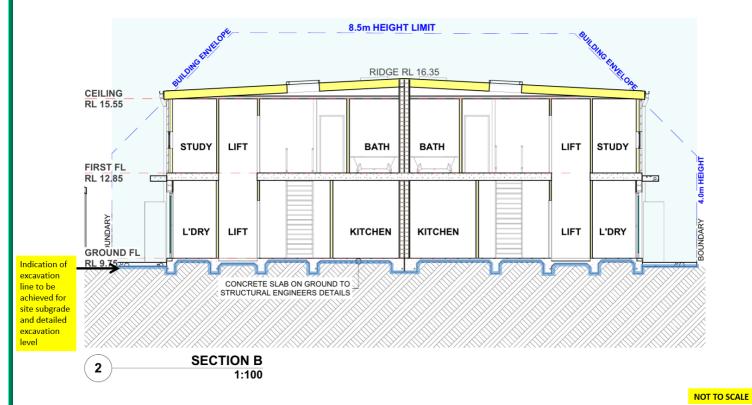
Indication of excavation extent to achieve site subgrade and detailed excavation level
